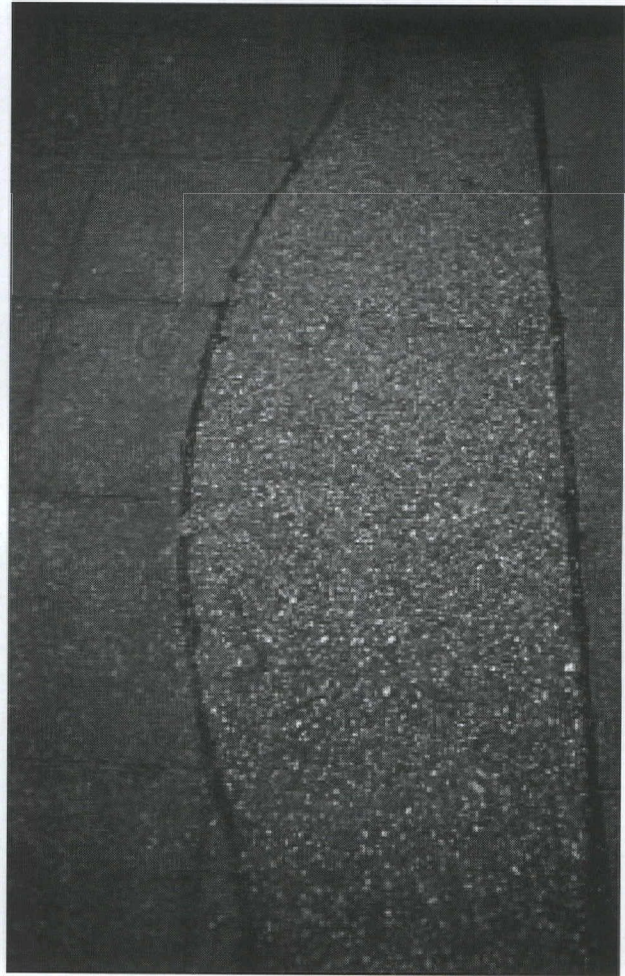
Pavement detail at 15th Street entrance with large beige pebble exposed aggregate sections, 1997, see plan sheet 33 (Land Ethics, Inc.).
